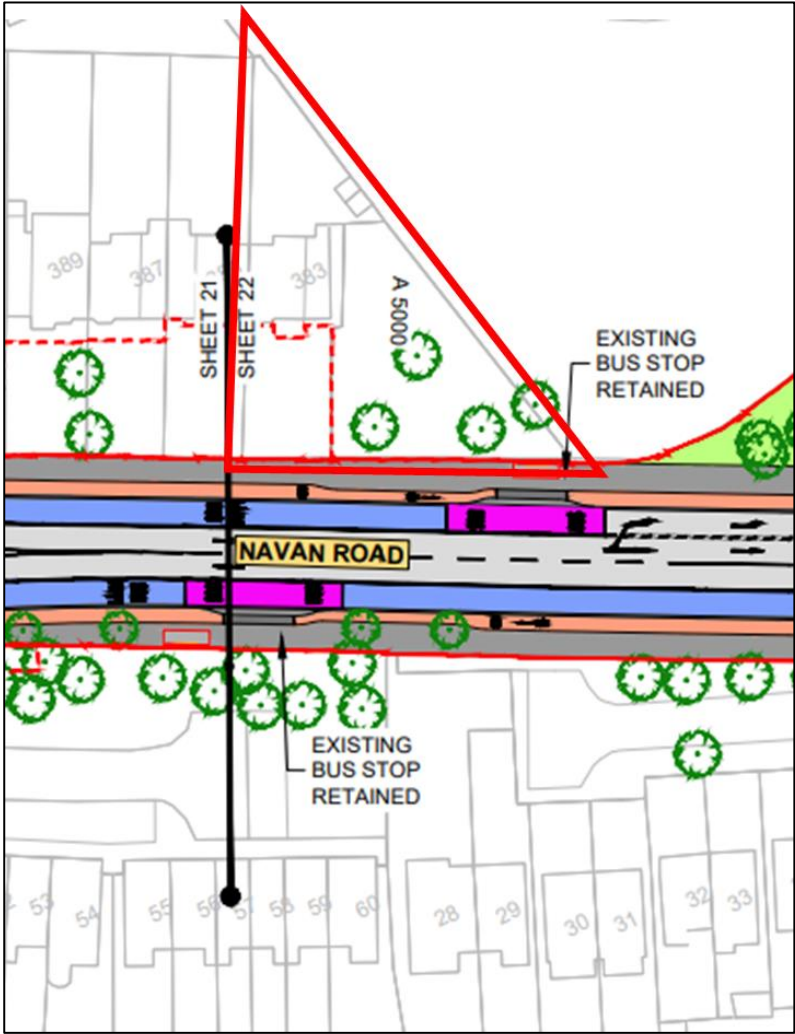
Proposed new Layout at 383 Navan Road
